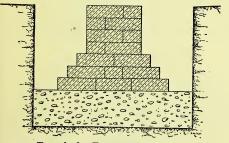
Trench for Footings of Brick-and-a-half Wall.
